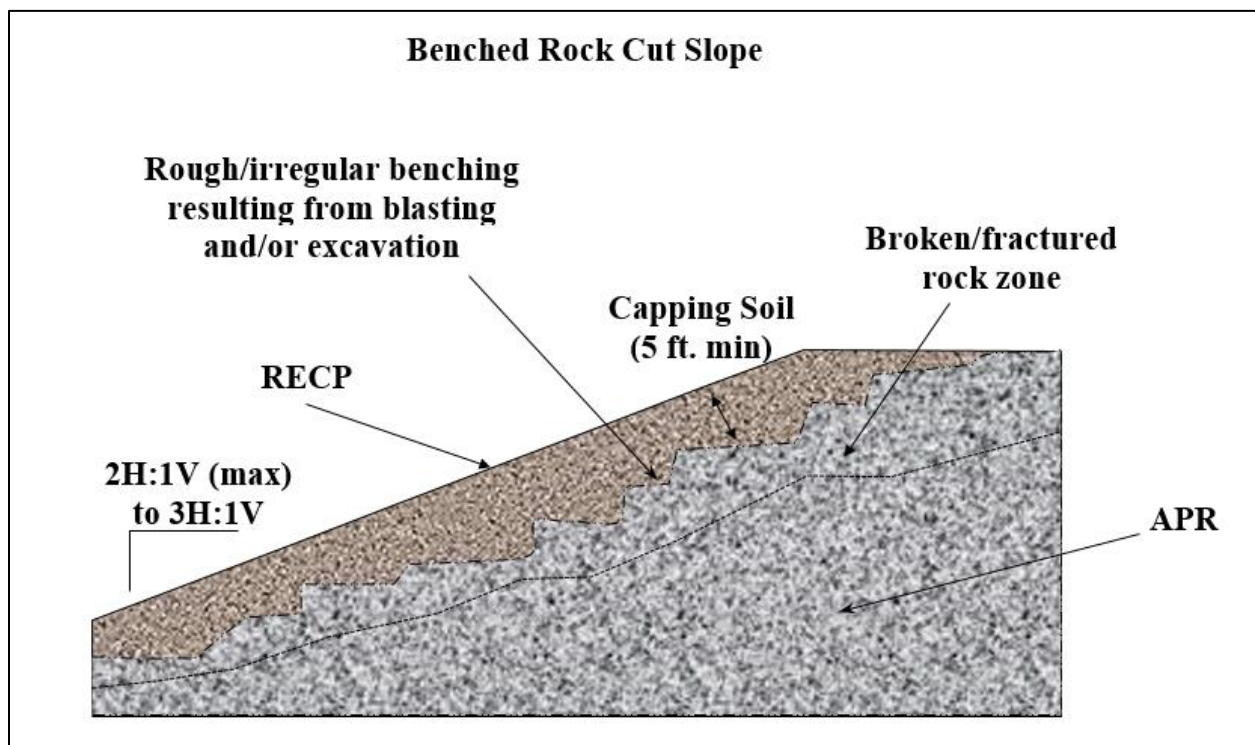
Typical Section: Minimum Requirements Rock Cut with Slope Face Steeper than 3H:1V and Not Exceeding 2H:1V (Condition C)
